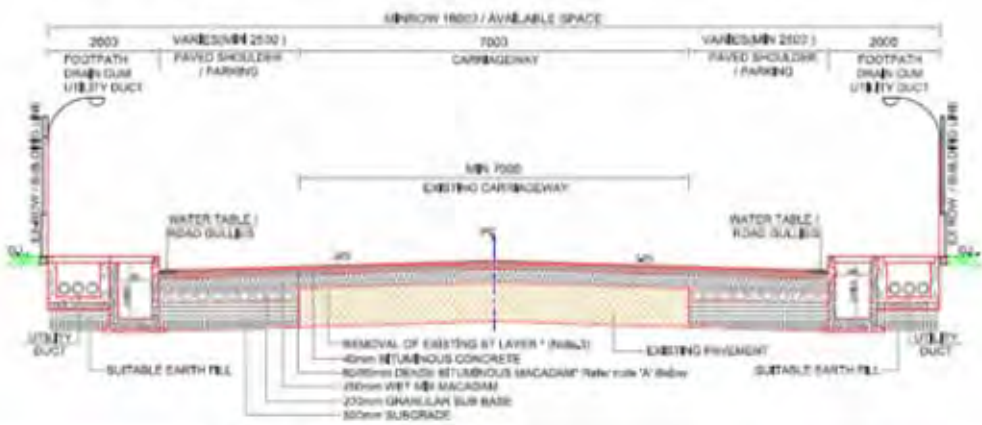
C2-R-N: Two lane Carriageway with Paved Shoulder in Rural Area (New Construction)
